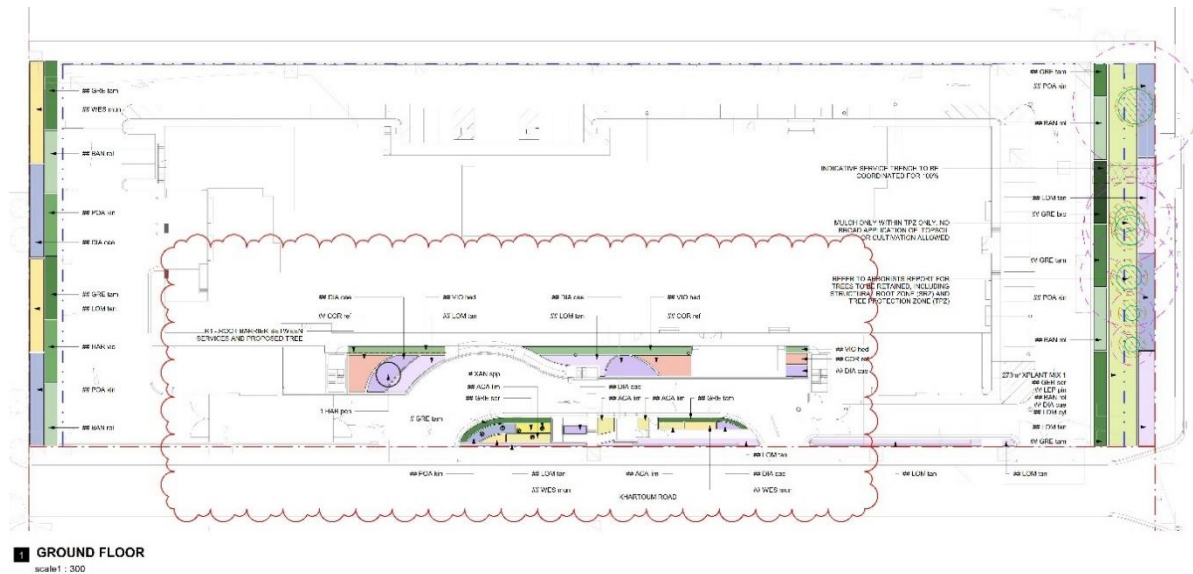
Draft landscape concept design plan for the ground floor (Source: AECOM). Refer Appendix C of the EIS
